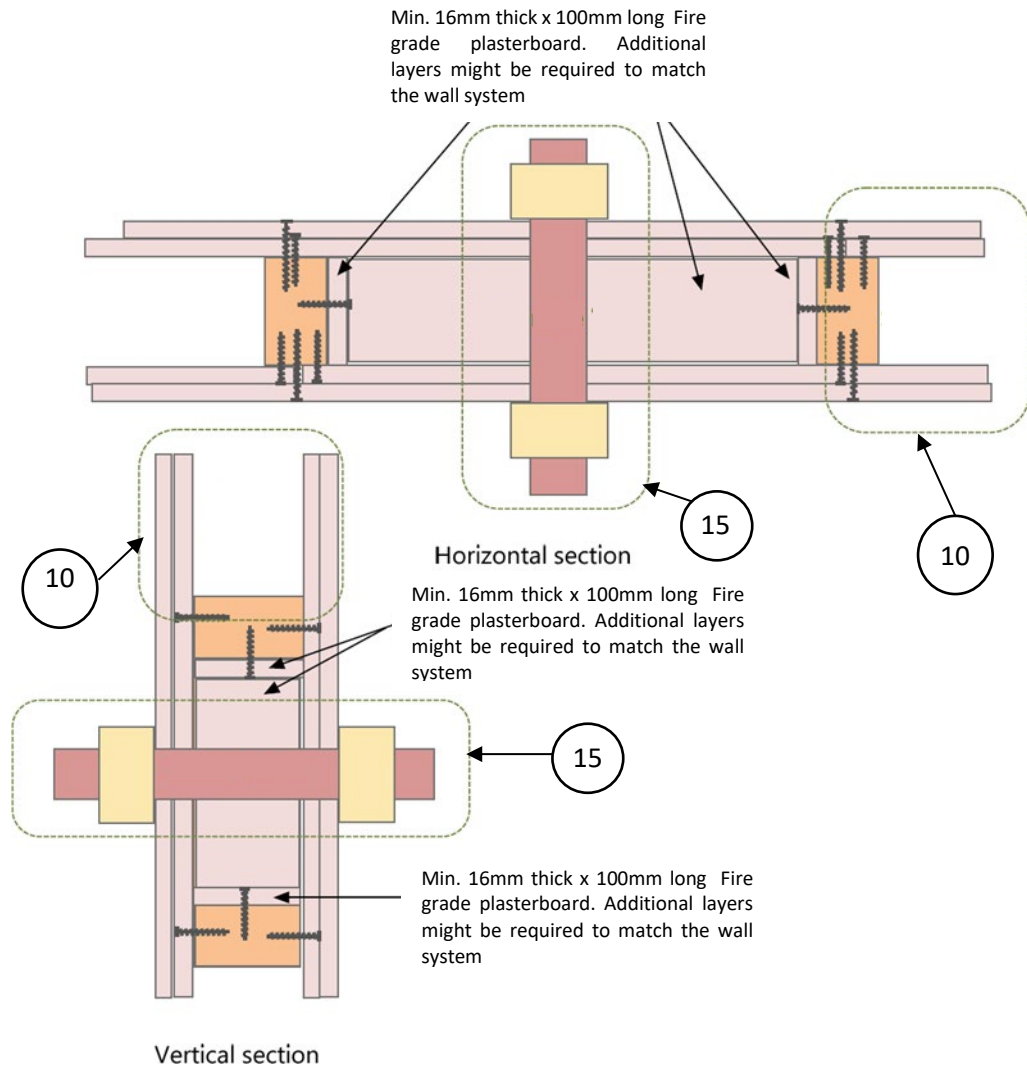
Proprietary plastic pipe and fire collar protection systems used with frame out detail – Plan and Section view
